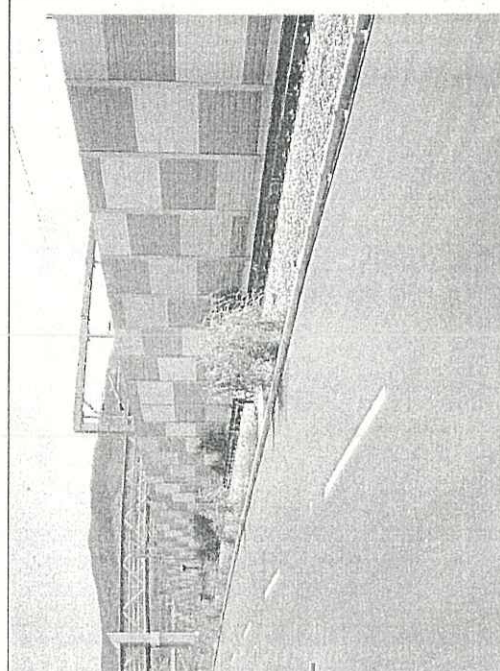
Noise Barriers along the uptrack of the West Rail, adjacent to the Eastern Perimeter Road
